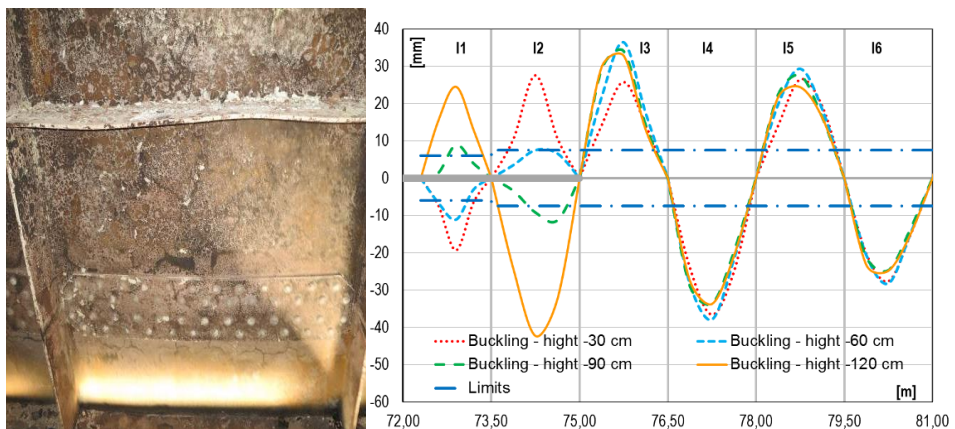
Failure mode of the girders webs: a) picture of local bulges of the web and deformations of the horizontal ribs, b) local bulges of the 9 m long part of the girder 10-11 – values for level of measurements 30/60/90/120 cm below the deck
